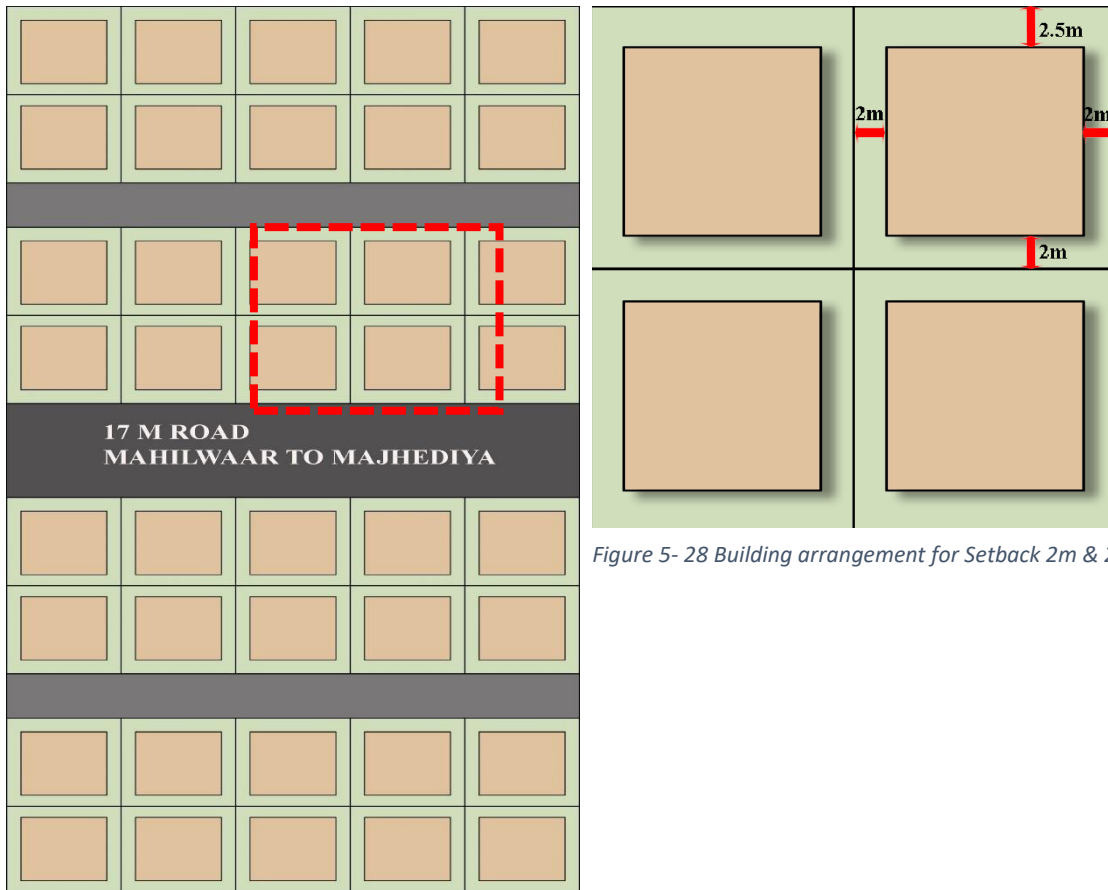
28 Building arrangement for Setback 2m & 2.5m
